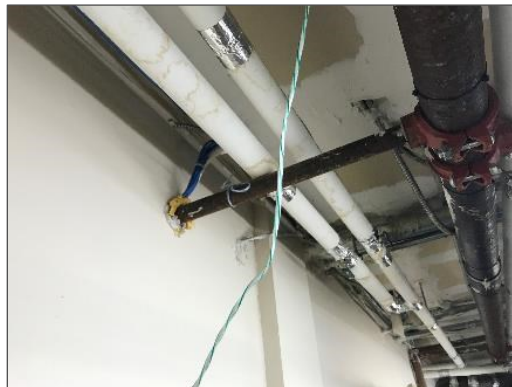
Water stained fibreglass pipe insulation in the Storage Room.
